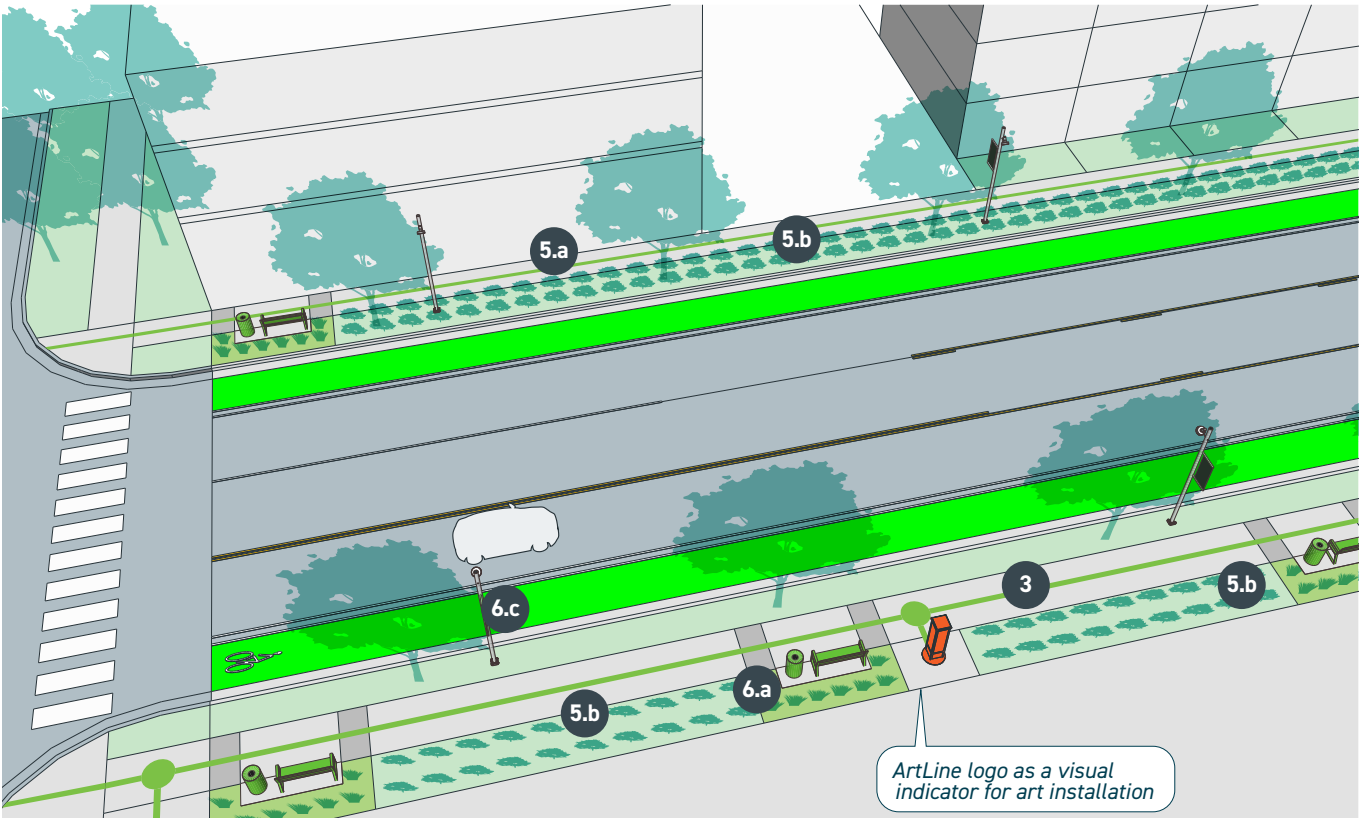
A conceptual illustration of Pierce Street (between W. Colfax and Lakewood Place)
